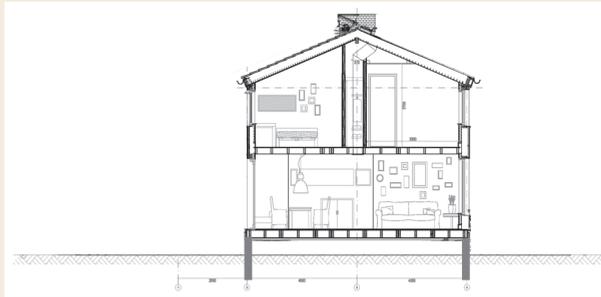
Section of the original terraced dwelling that stood as a model for the Prêt-à-Loger house [Prêt-à-Loger team]
